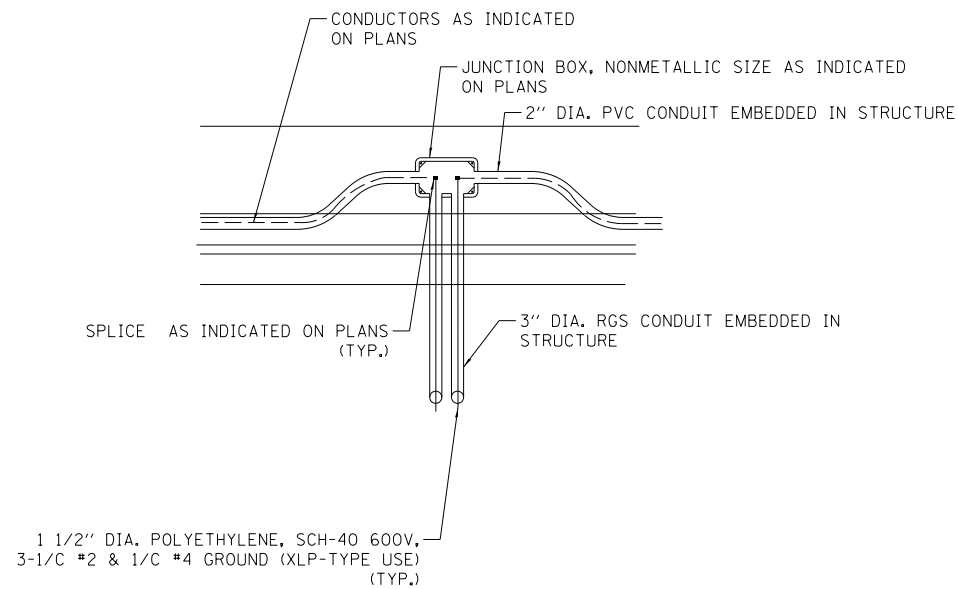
DETAIL C- CANFIELD ROAD/ORIOLE AVE.
